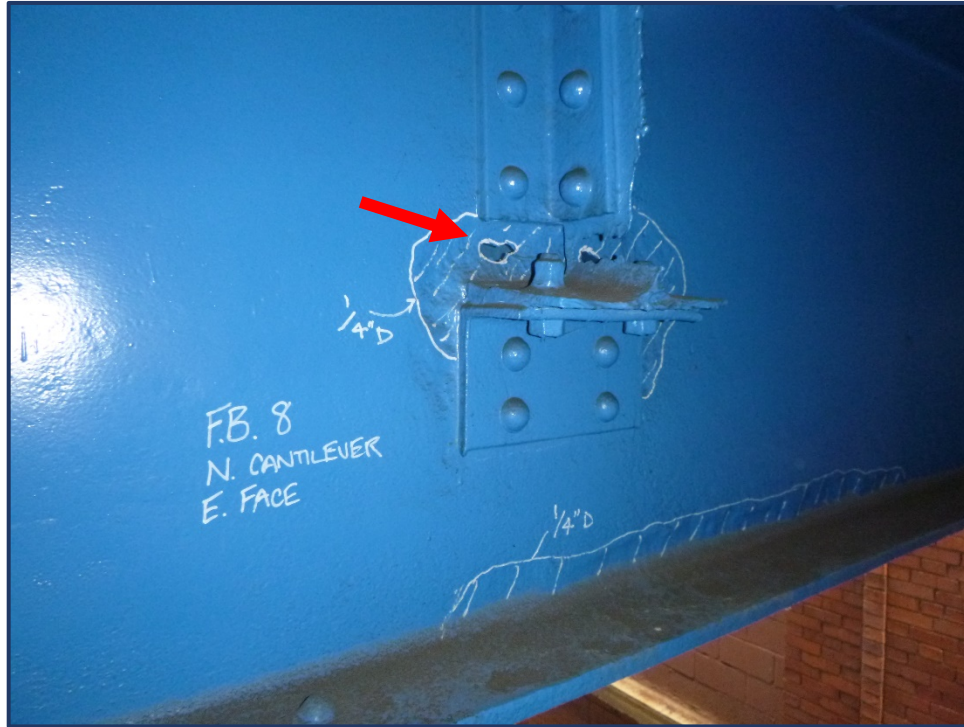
Unit III, FB 8, Areas of Painted over Section Loss and Corrosion Holes at Abandoned Stringer Connection
